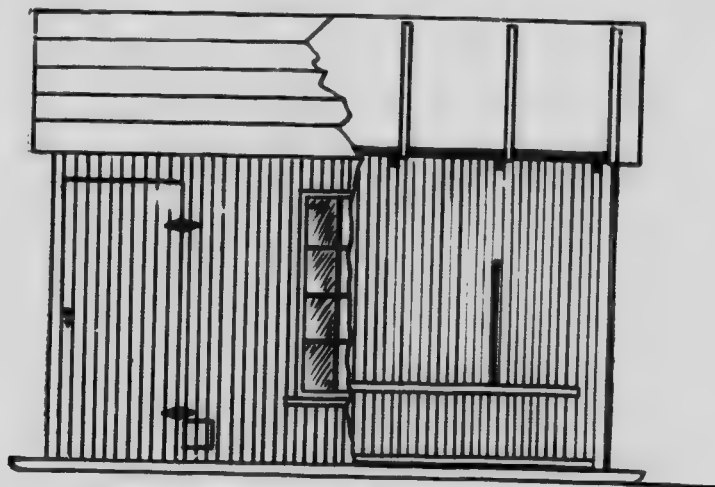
COLONY LAYING HOUSE CONSTRUCTION.
